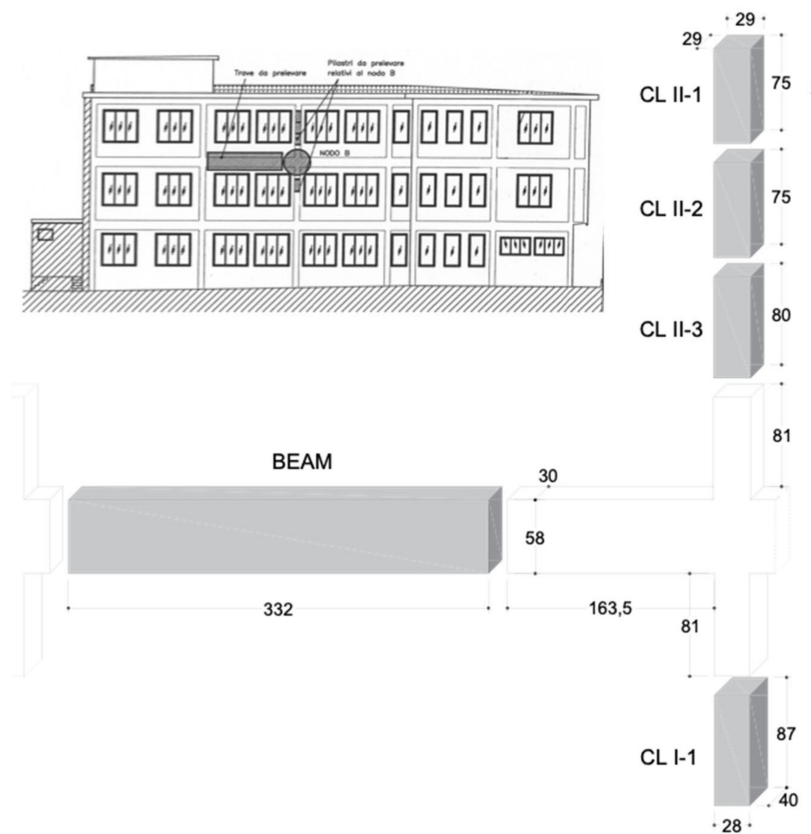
The five reinforced concrete elements extracted from the Italian school building.
